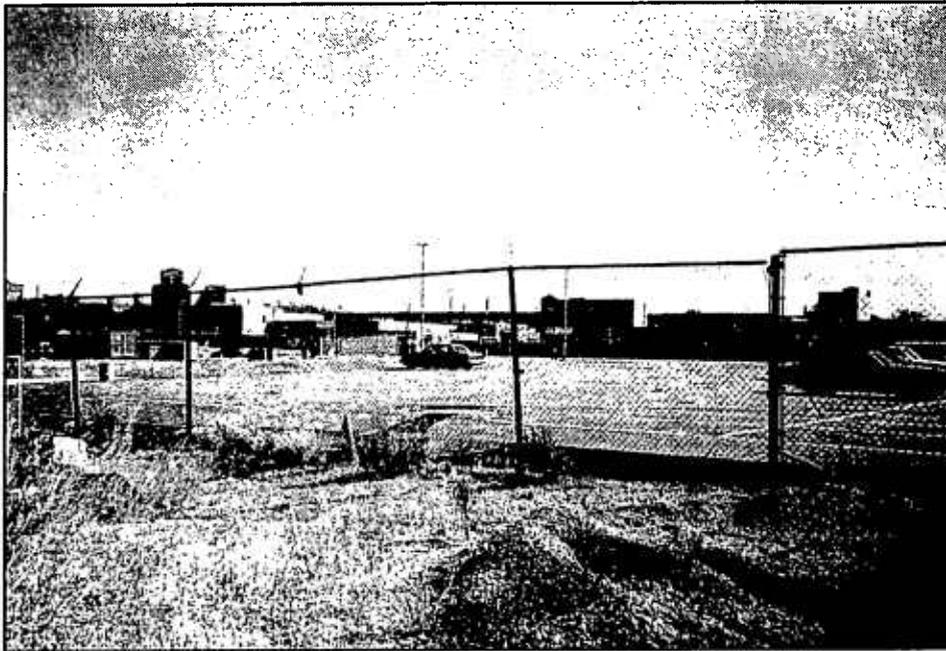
Photo A. Proposed cogeneration facility development site looking northeast towards Vernon Boulevard.
